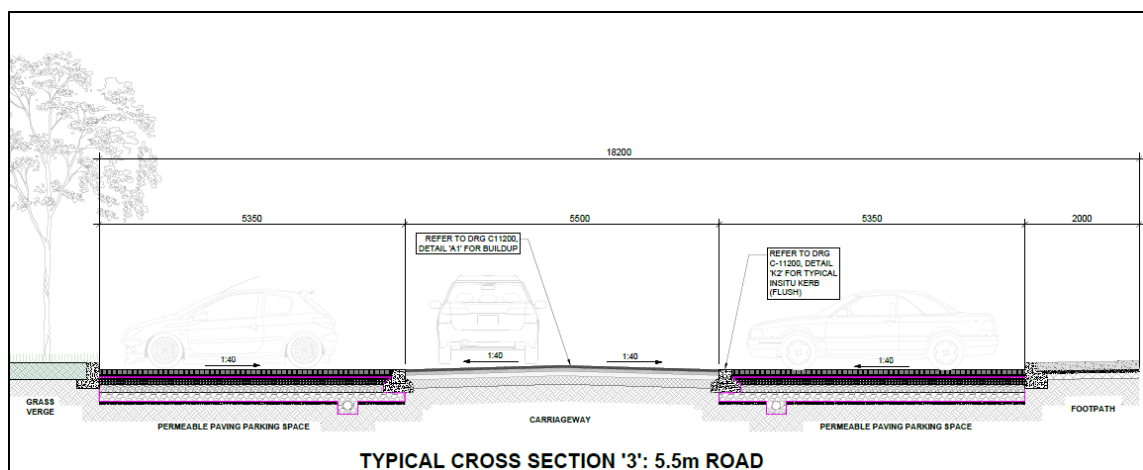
Proposed Cross Section 3 – 5.5m Road with Car Parking (Source: BMCE)
